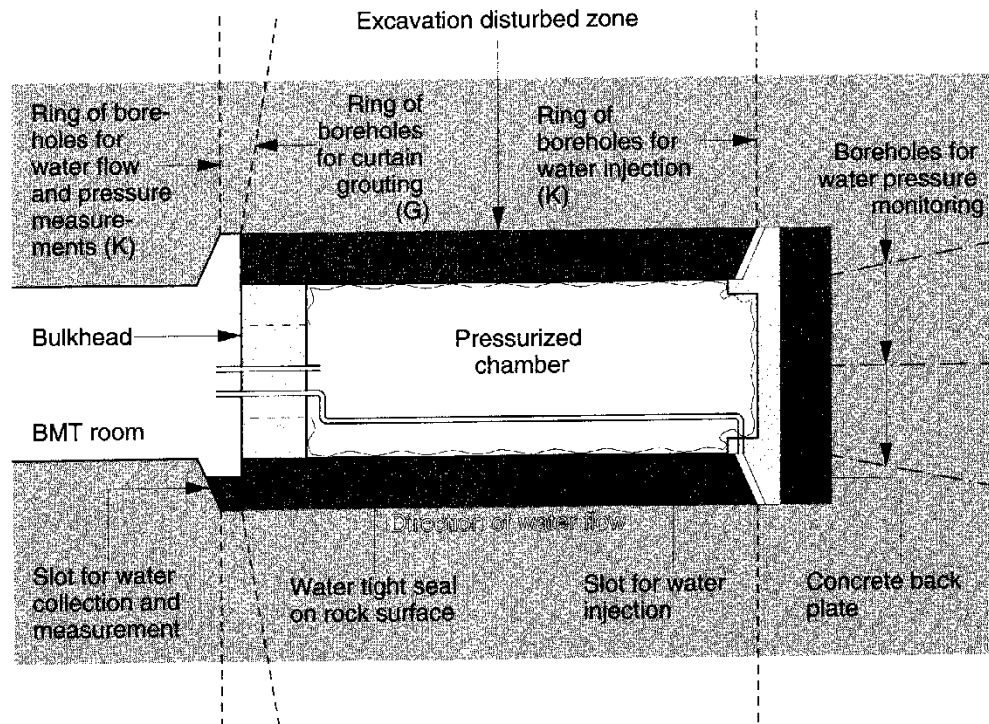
General layout of the experiment to characterize and grout the excavation disturbed zone around the inner BMT drift.
